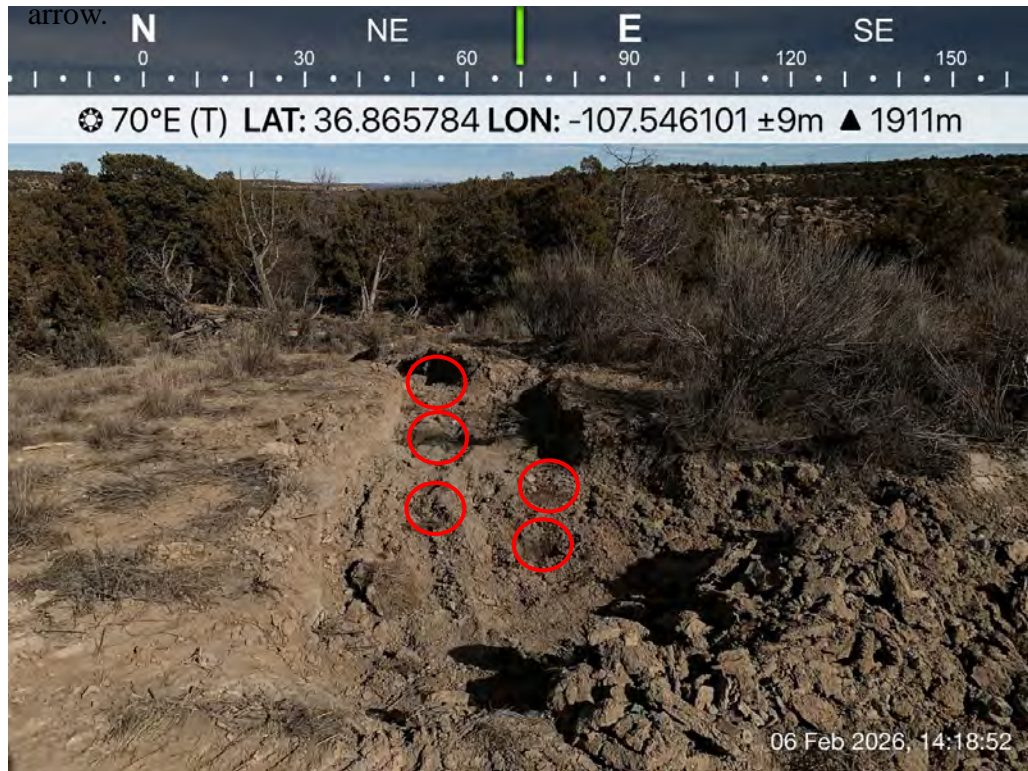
SS29 collected as a 5pct sample from the north fork of the release area excavation.
